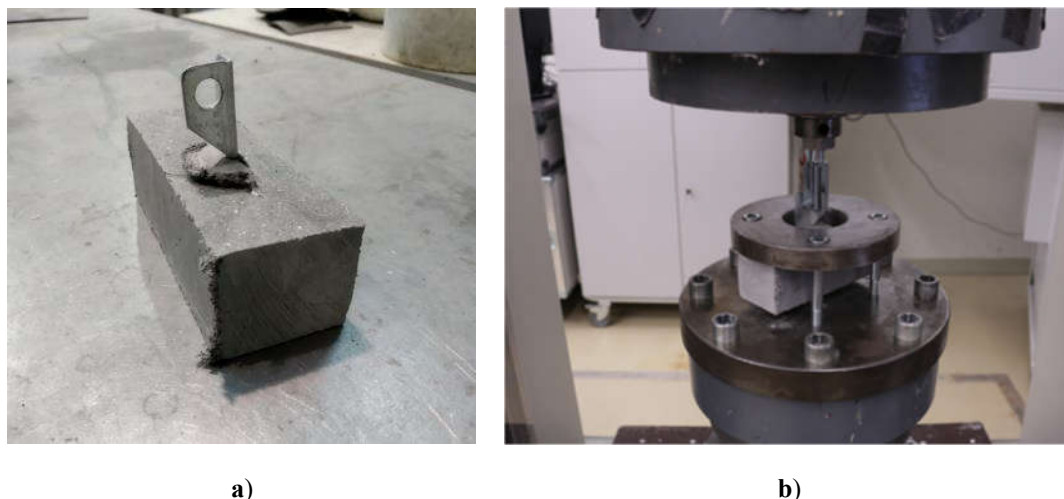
a) Specimen for a connector pullout test, and b) pullout test setup.
